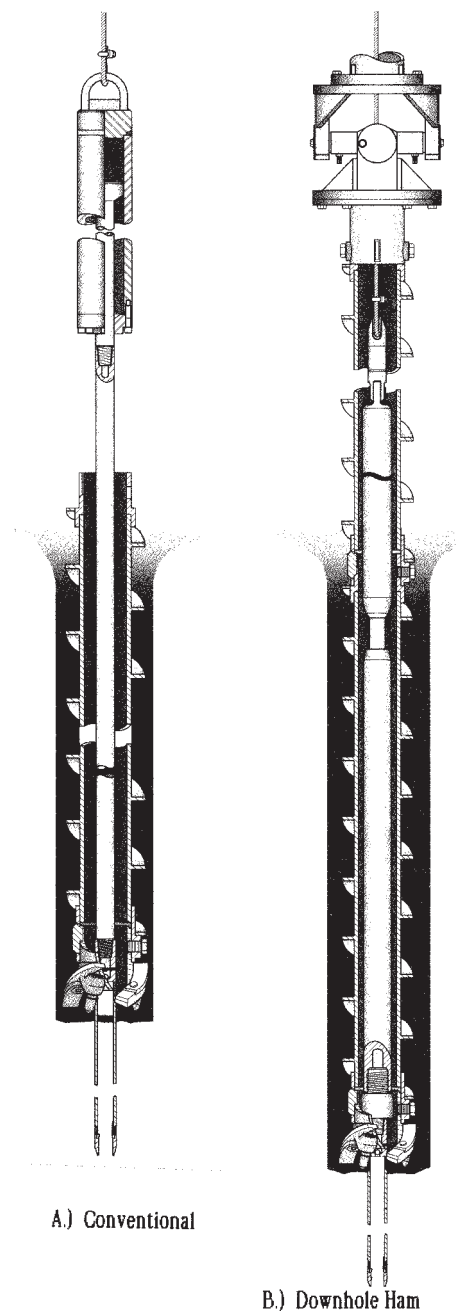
In-Hole-Hammer and Conventional Drive Hammer<sup>5</sup>
